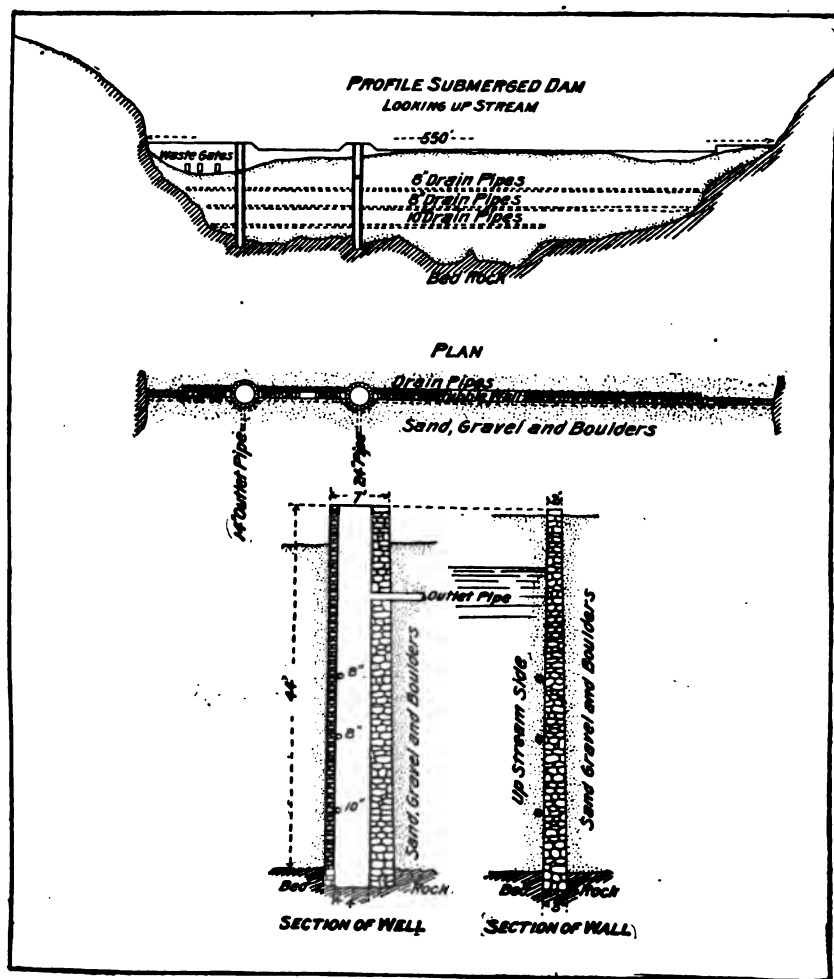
PLAN AND PROFILE OF PACOIMA DAM.
